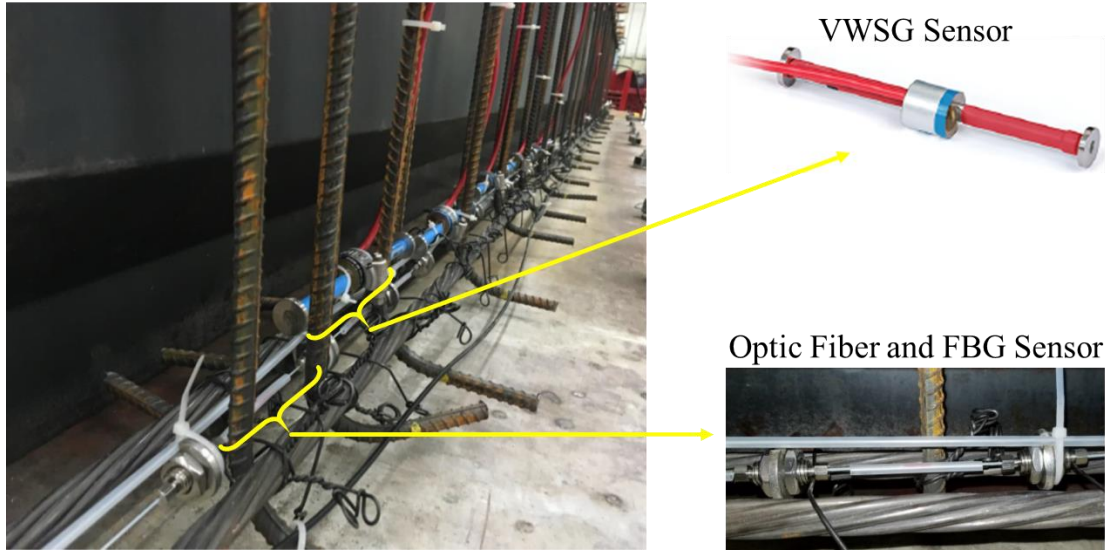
Placement of the FBGs and VWSGs in the constructed girder
